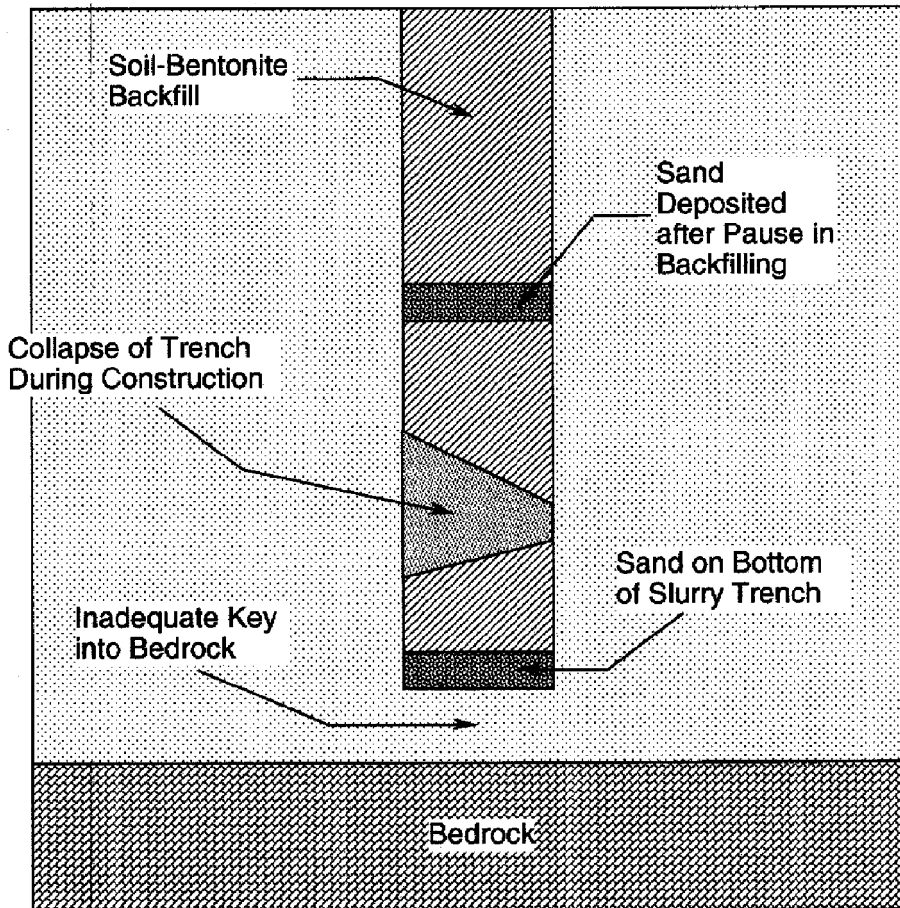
Examples of Problems Caused by Improper Backfilling of Slurry Trenches.
